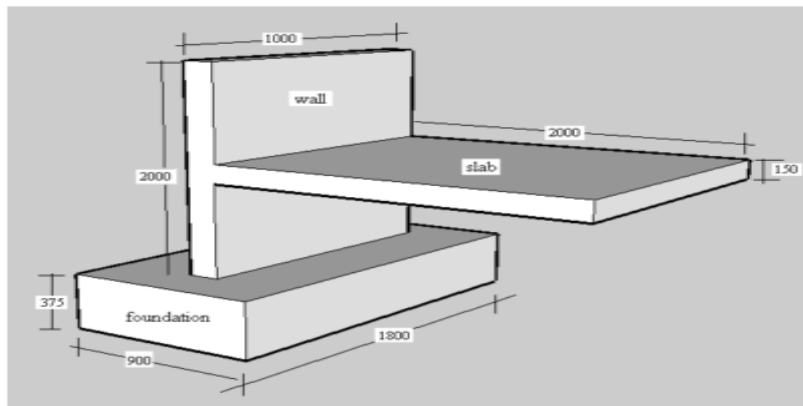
Typical Dimensions of Wall-Slab Sub-Assemblage (Source: [5])
